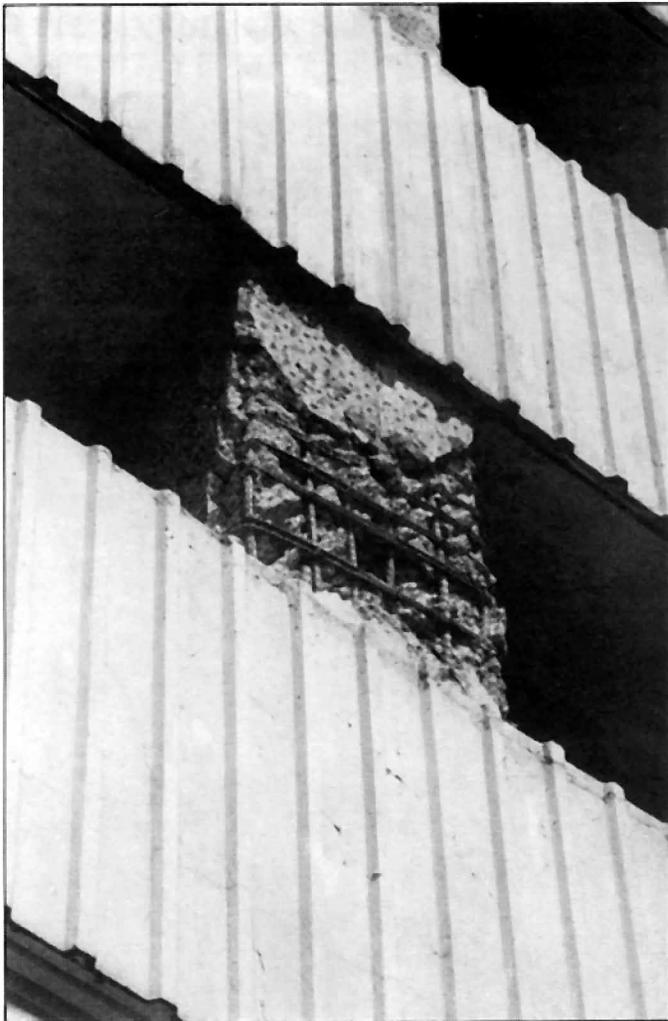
COLUMN FAILURE AT ALMACENES
